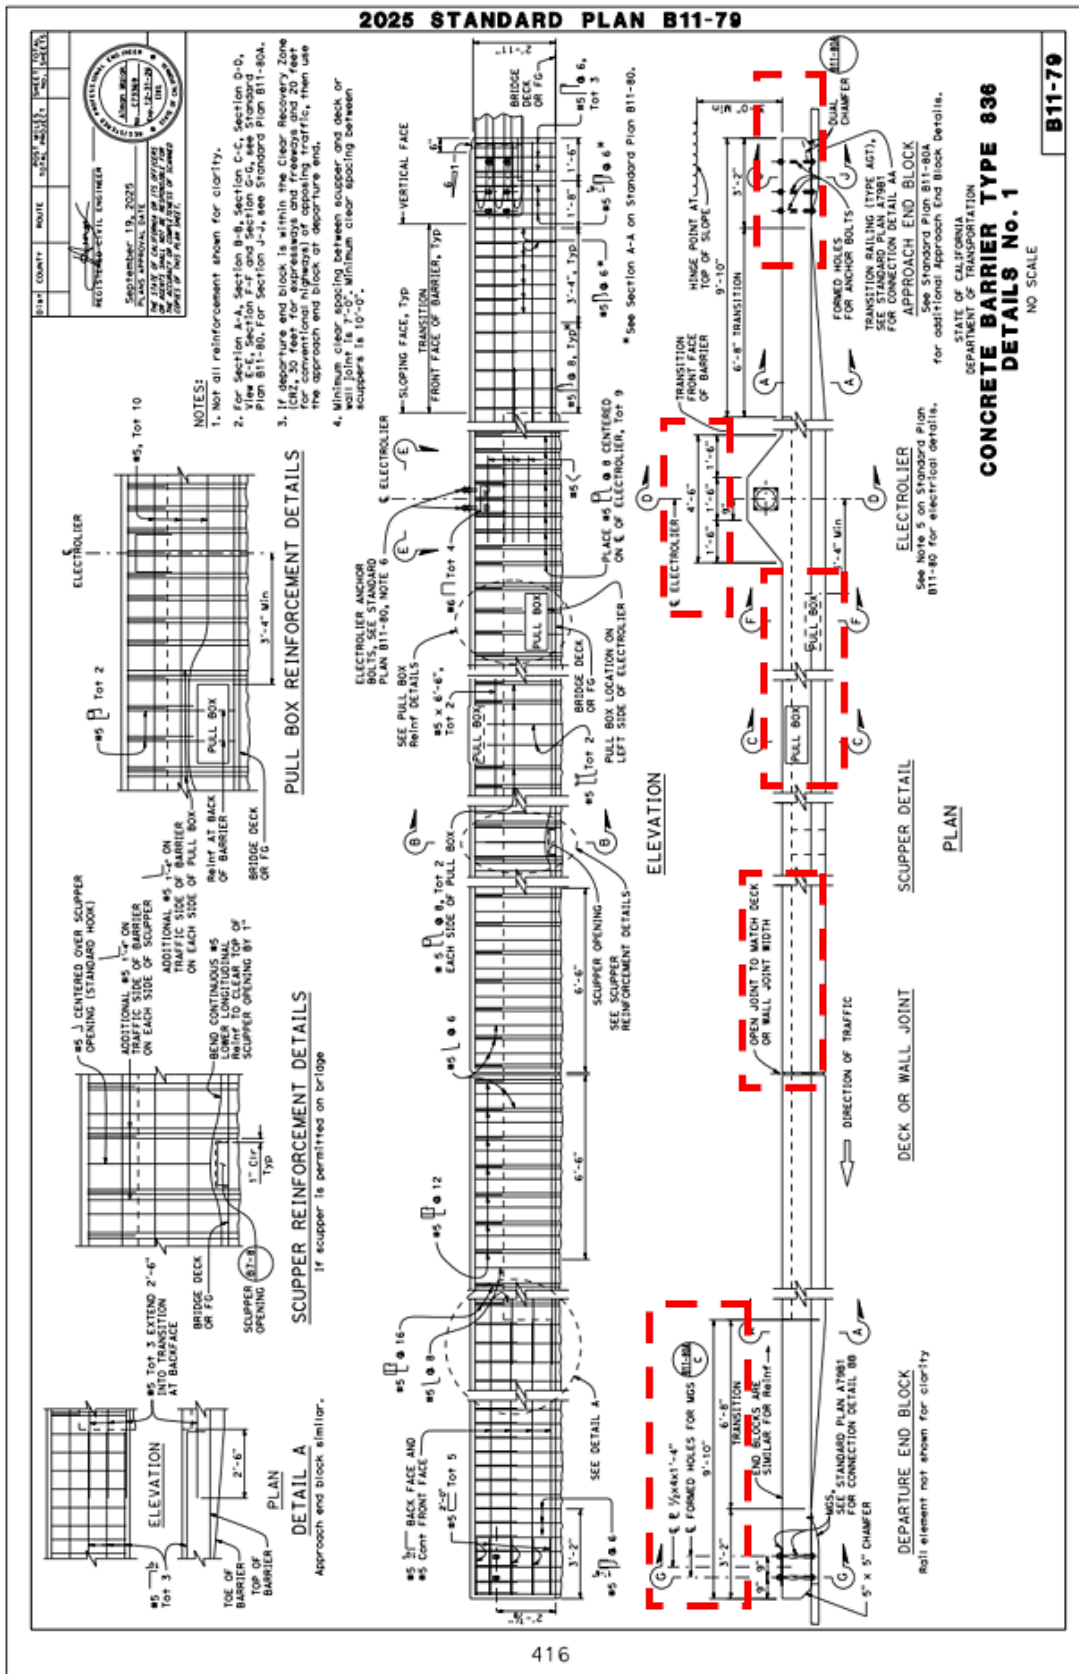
Standard Plan B11-79 Showing Transition, Joints, Electrolier, and Pull Box Details
